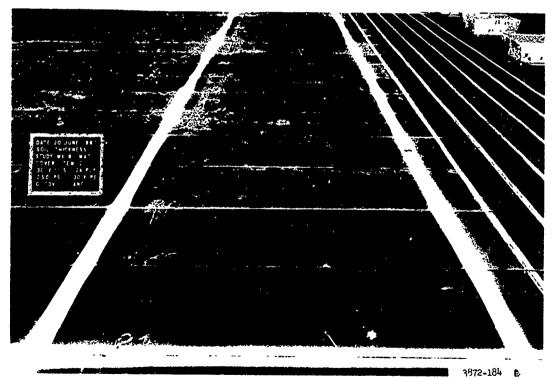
Longitudinal deformation of 1 in. in test section II, lane 1, item 1, after 12 coverages
